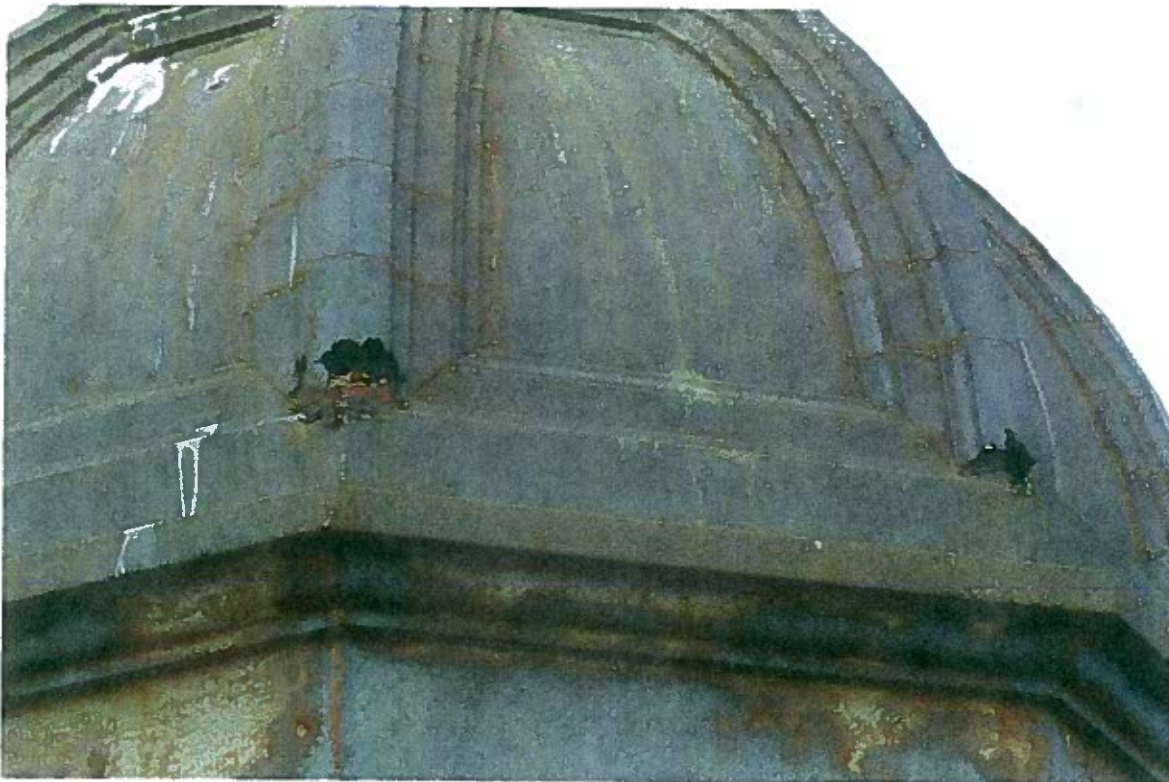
Detail of corrosion at chimney/roof top ventilator cap.
